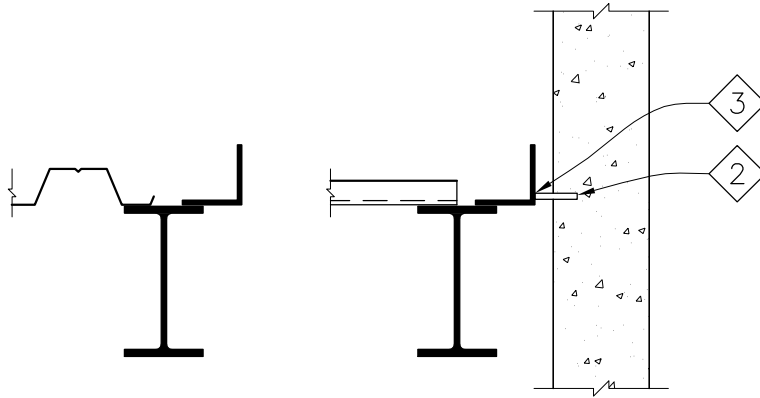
PRECAST CONCRETE TOLERANCES
